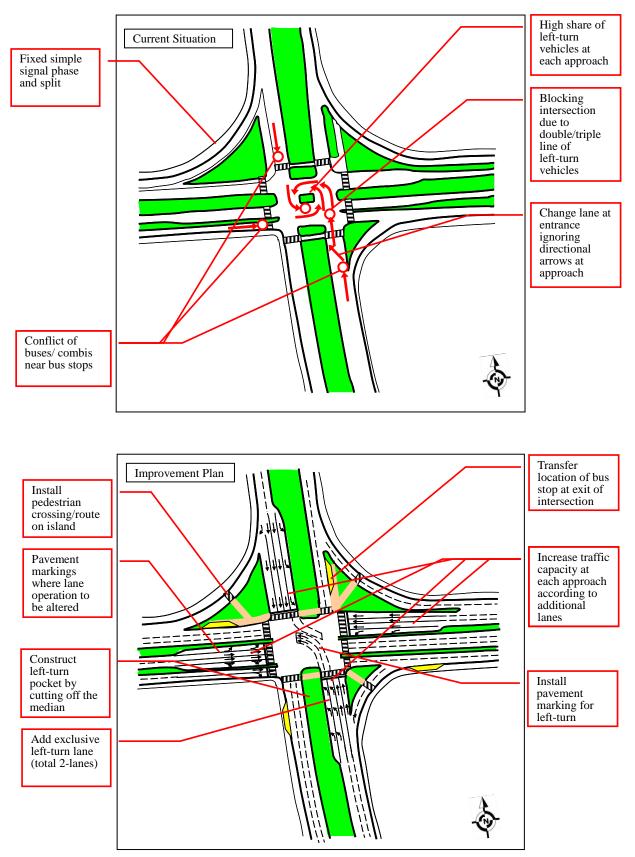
A Sample of Plan for Intersection Improvement
